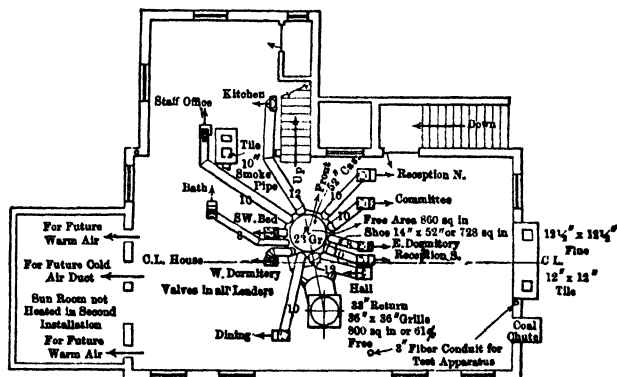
Plan of Warm-air Heating Plant with One Recirculating Duct. (See Fig. 54 for section)
